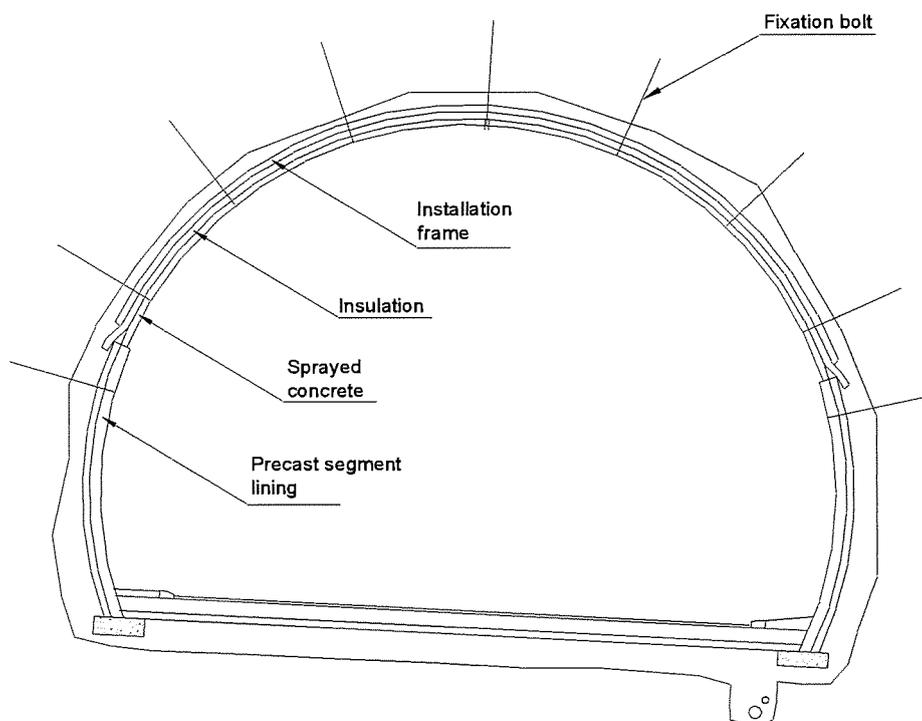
Water and frost protection with concrete wall elements and PE-foam/sprayed concrete
